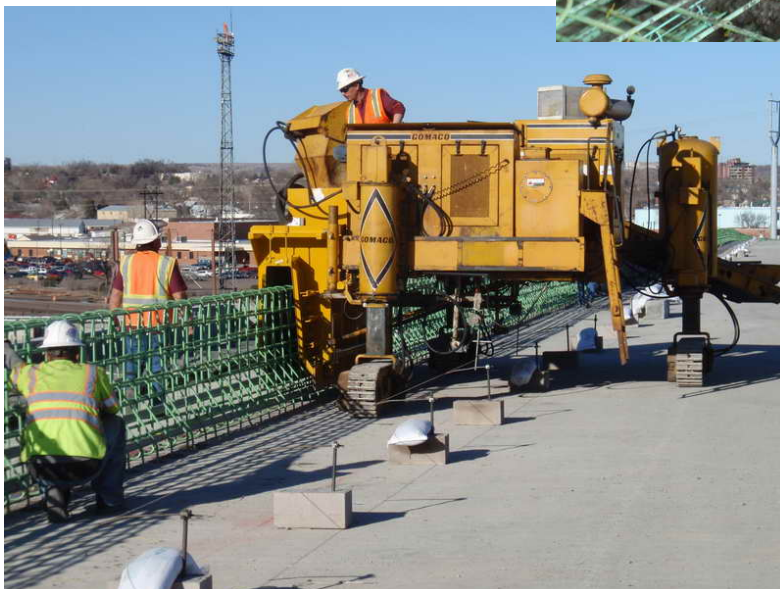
Cantilever 3 EB Segmental Construction – March 5, 2010:
